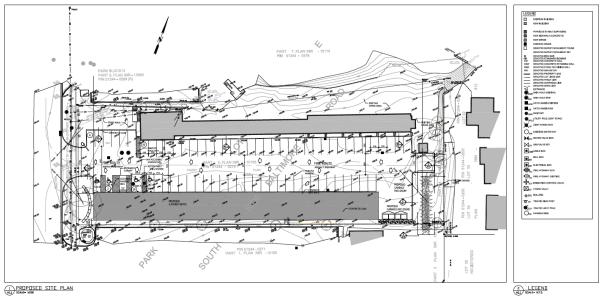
Proposed Site Plan courtesy of Archisystem Inc.
